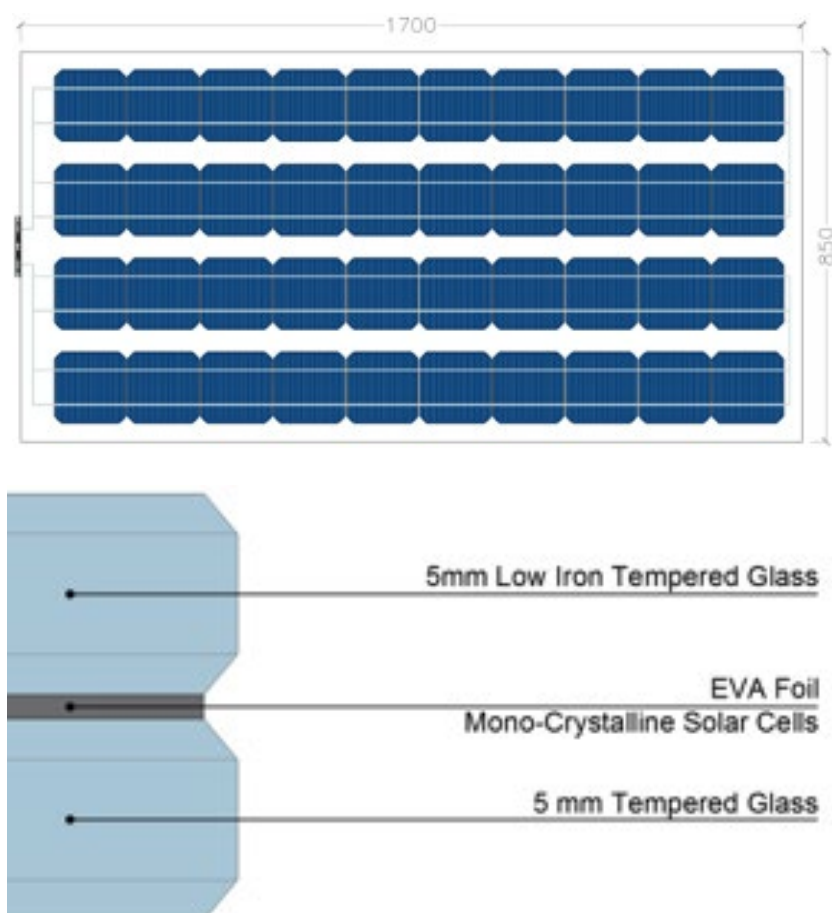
PV glass designed for the Parking Lot: plant and section. Source: Onyx Solar.
